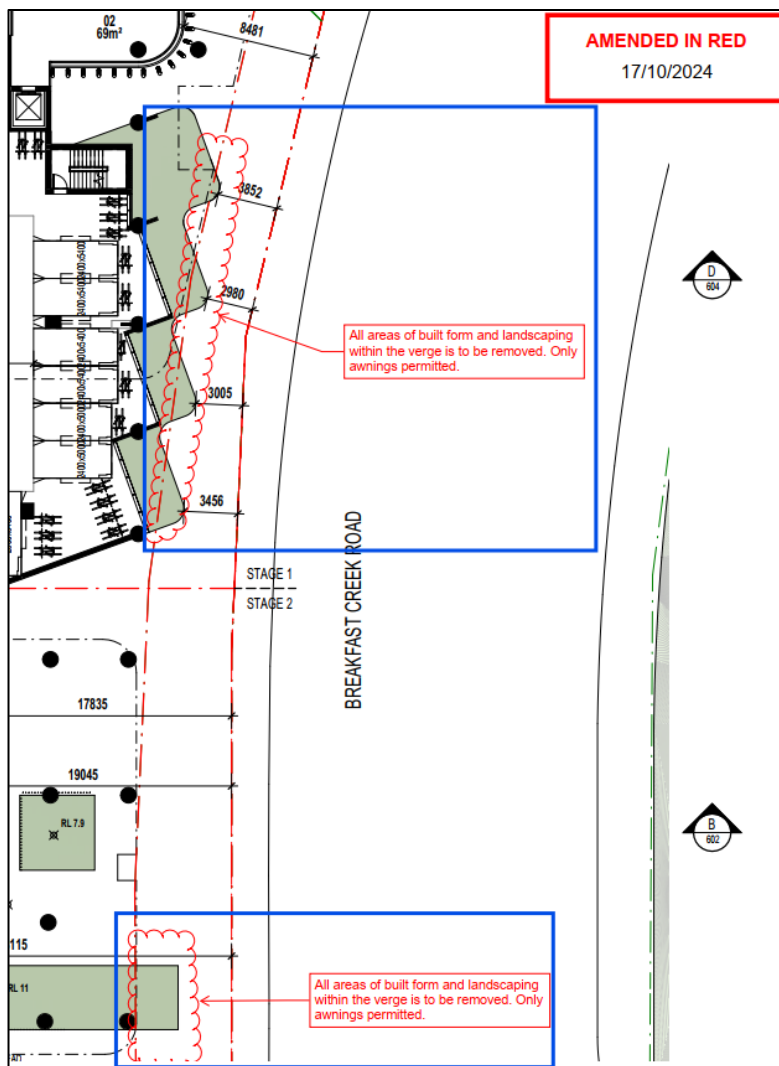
Example of Projections Deleted from Approval – Refer Att A (Source: Approved Plans A006534875)
